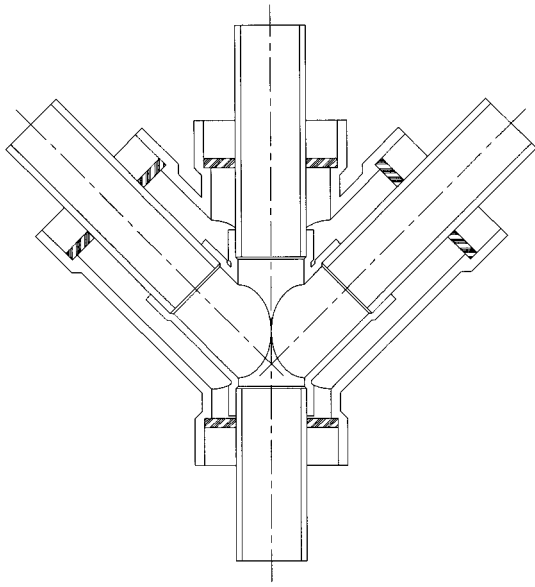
Example of thermoplastic 45° double lateral (wye) using molded code approved carrier fitting. (*Orion Fittings, Inc.*)
